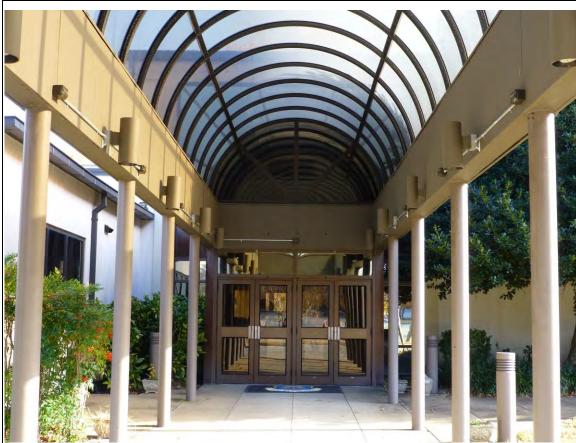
Building 2123, interior of modified main entry and canopy structure on the northwest elevation (ERDC-CERL, 2013).
